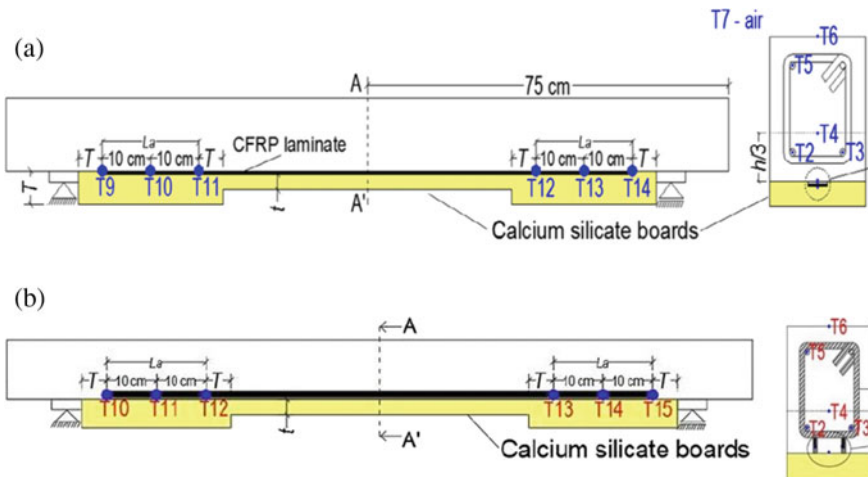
Finite element model of insulated CFRP-concrete specimen [13]
